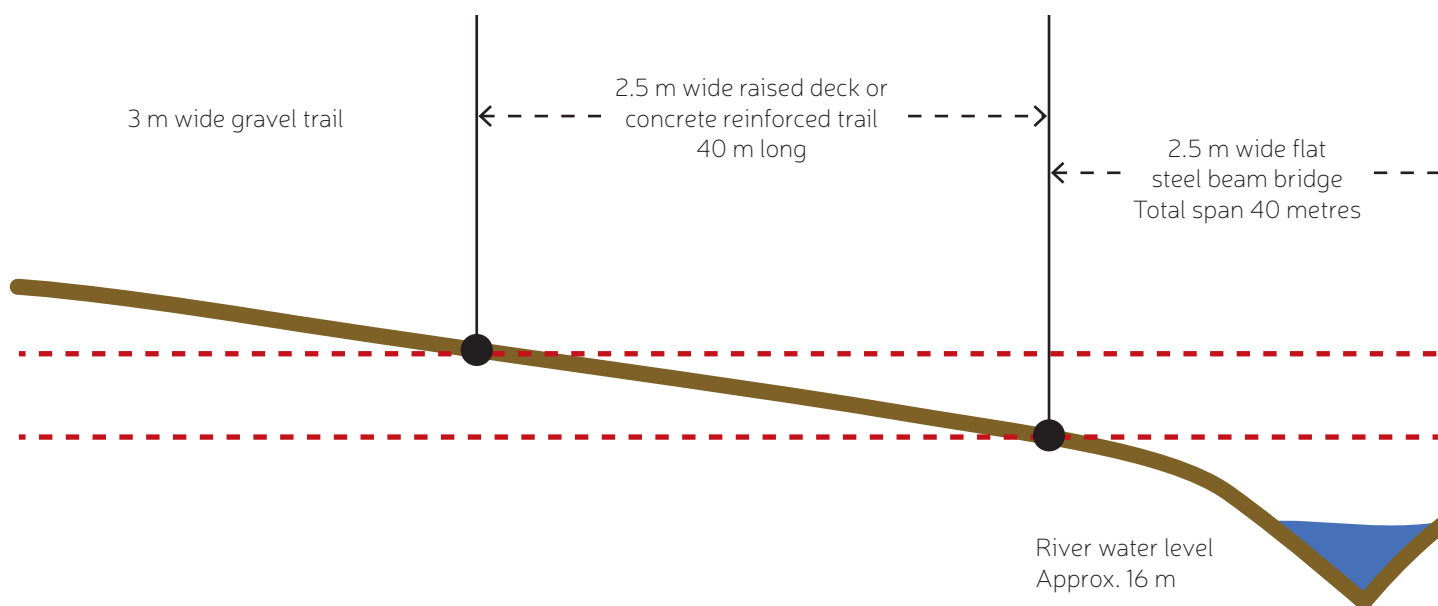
Flood Levels and Transition to Pedestrian Bridge Structure
